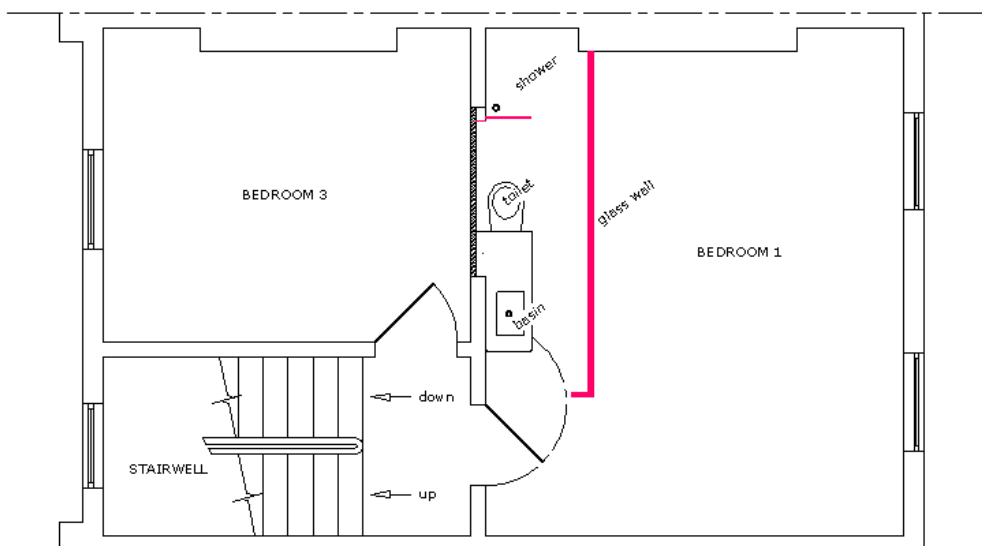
Proposed remodelling into two bedroom + addition of ensuite
